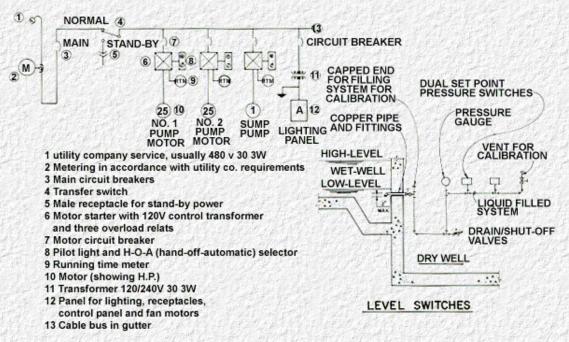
Single-Line Diagram - Dry-Pit Station
